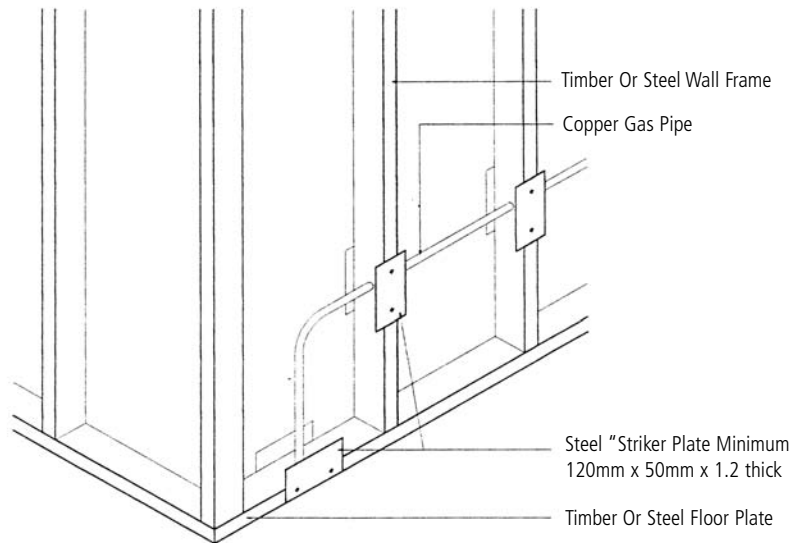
PIPING IN NON-FIRE RATED HOLLOW WALLS
